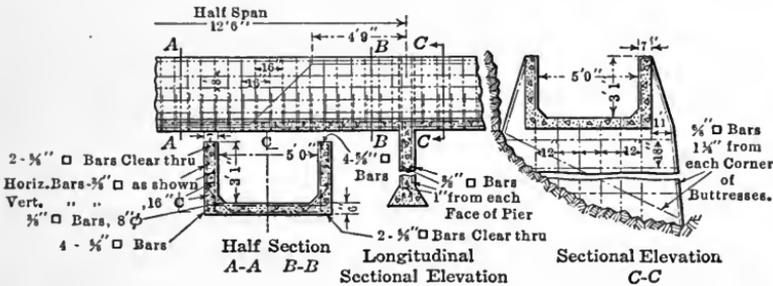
Reinforced concrete elevated flume. Yakima Valley Canal, Wash.
